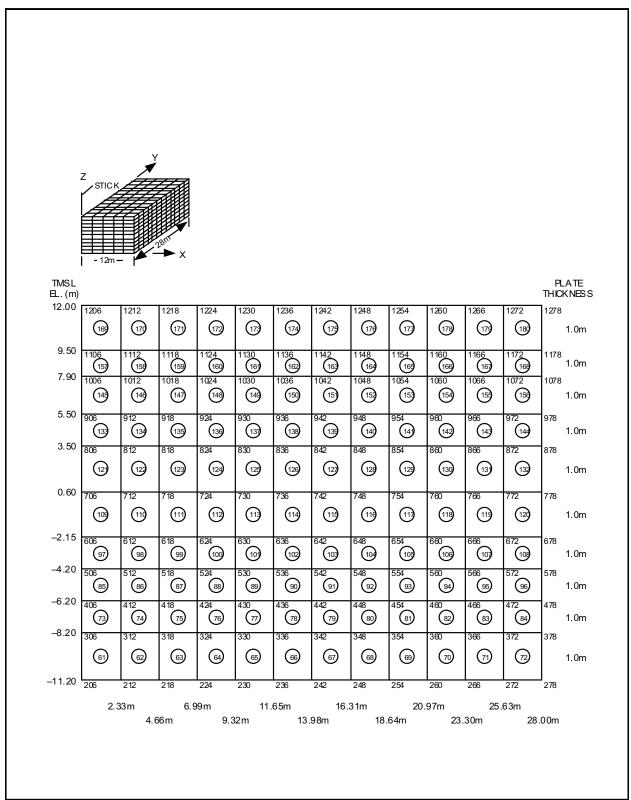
A-44 Plate Elements of the Side Wall (X = 12.00m)
